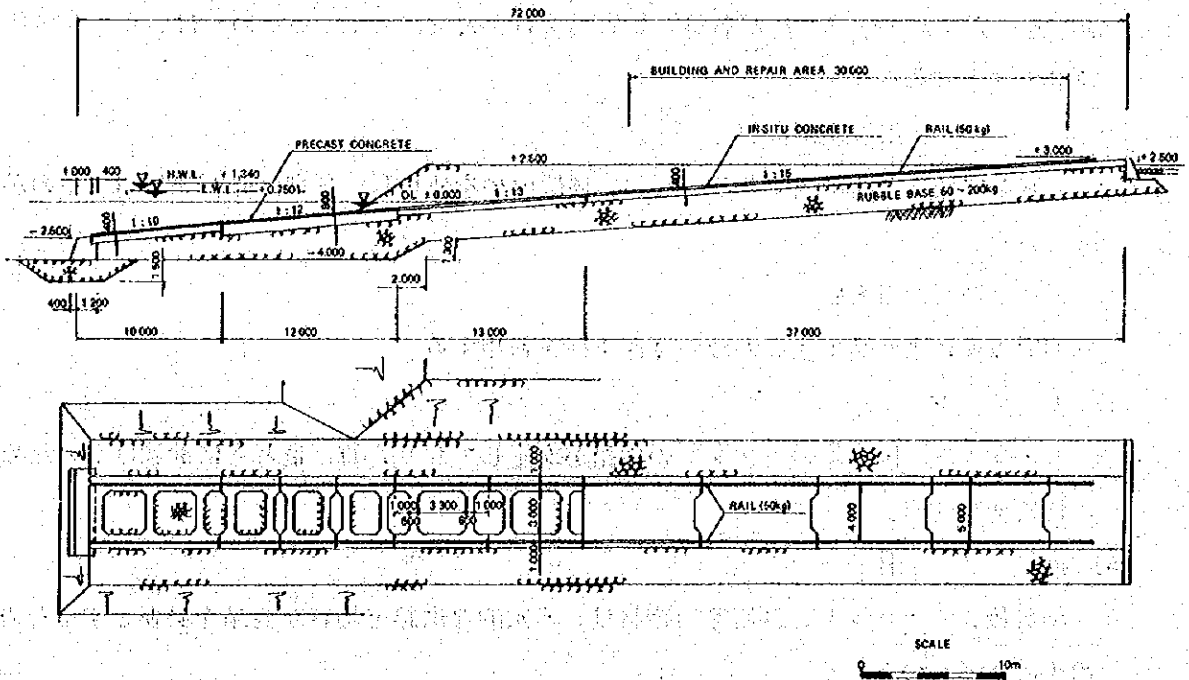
Cross Section of Dry Dock - Iloilo Port
